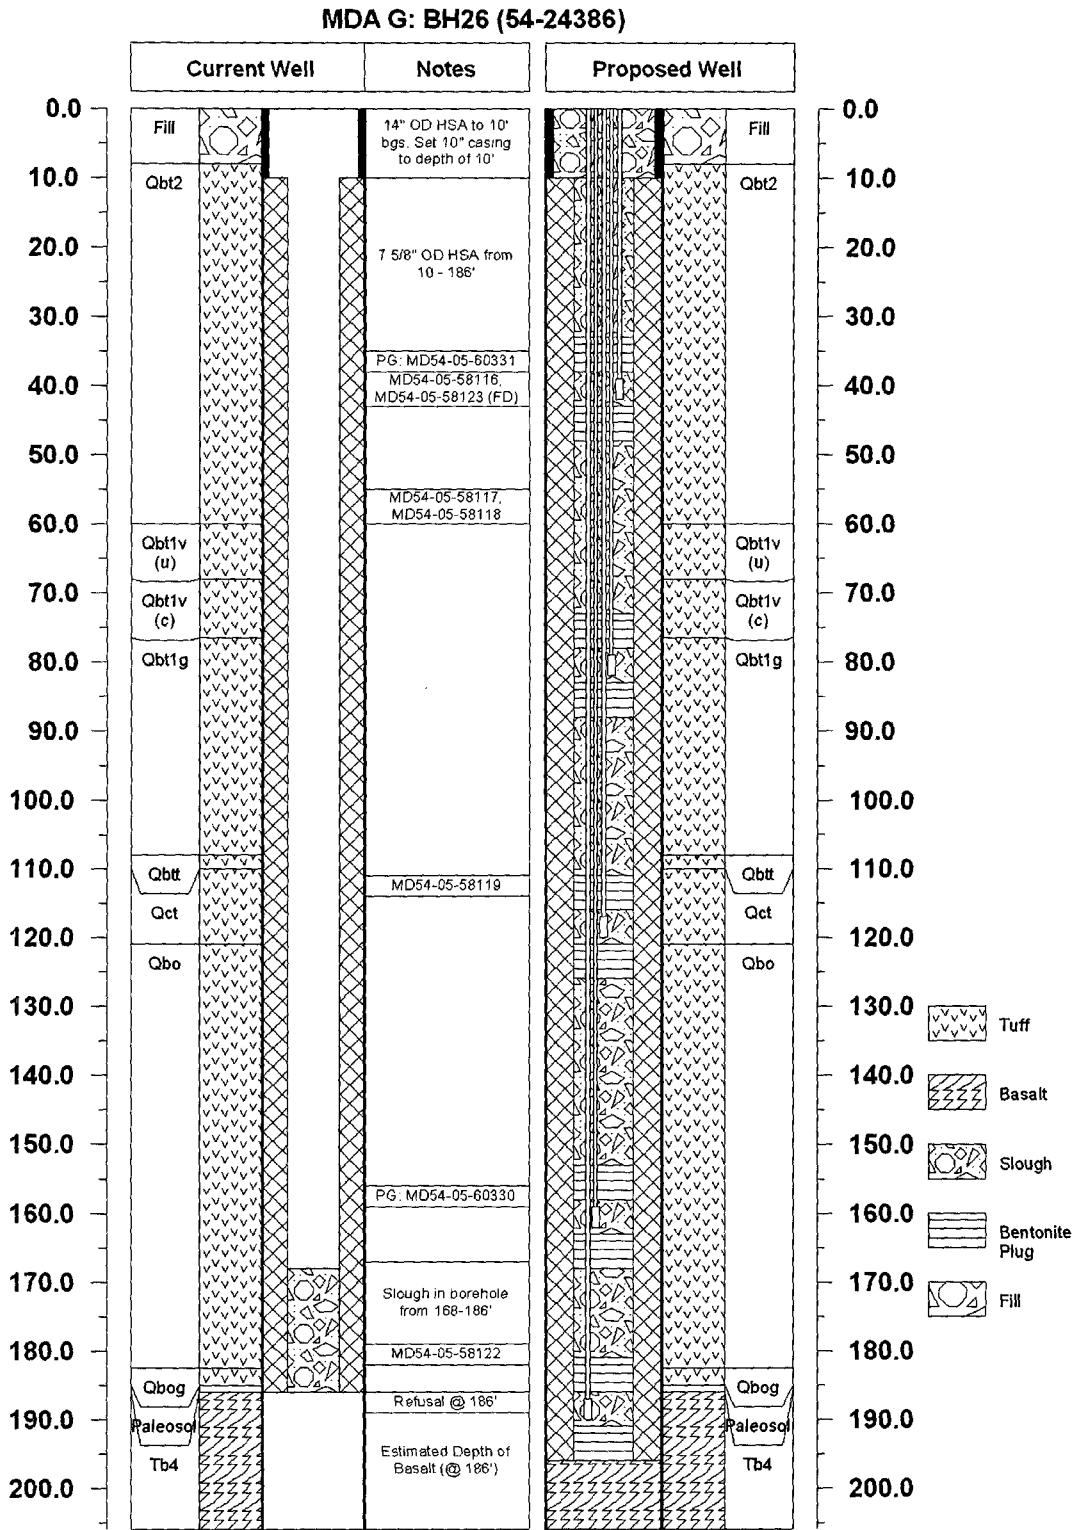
Detail of proposed borehole construction for BH-26, 54-24386
